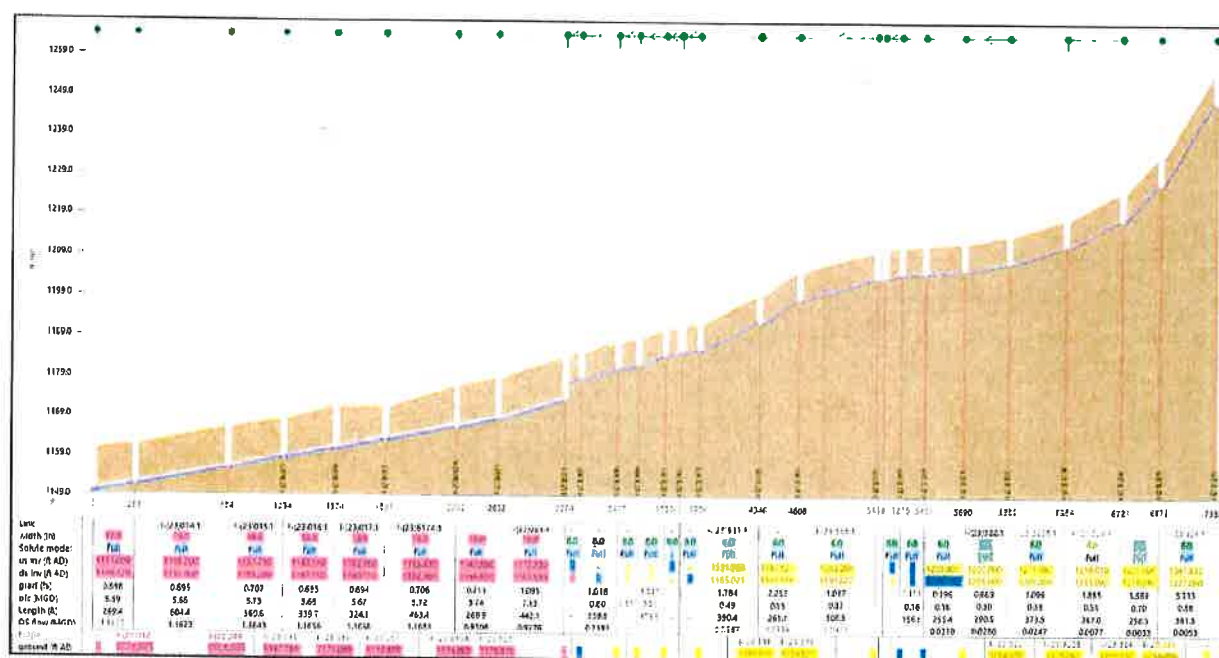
Hydraulic Profile Under Existing Conditions w/without Old Farmington Road Subdivision
